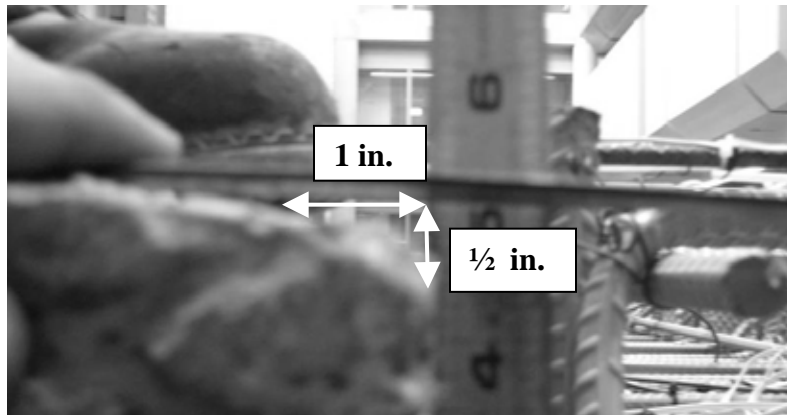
Chamfer fabricated in precast plant of 1 in. by 1/2 in.
